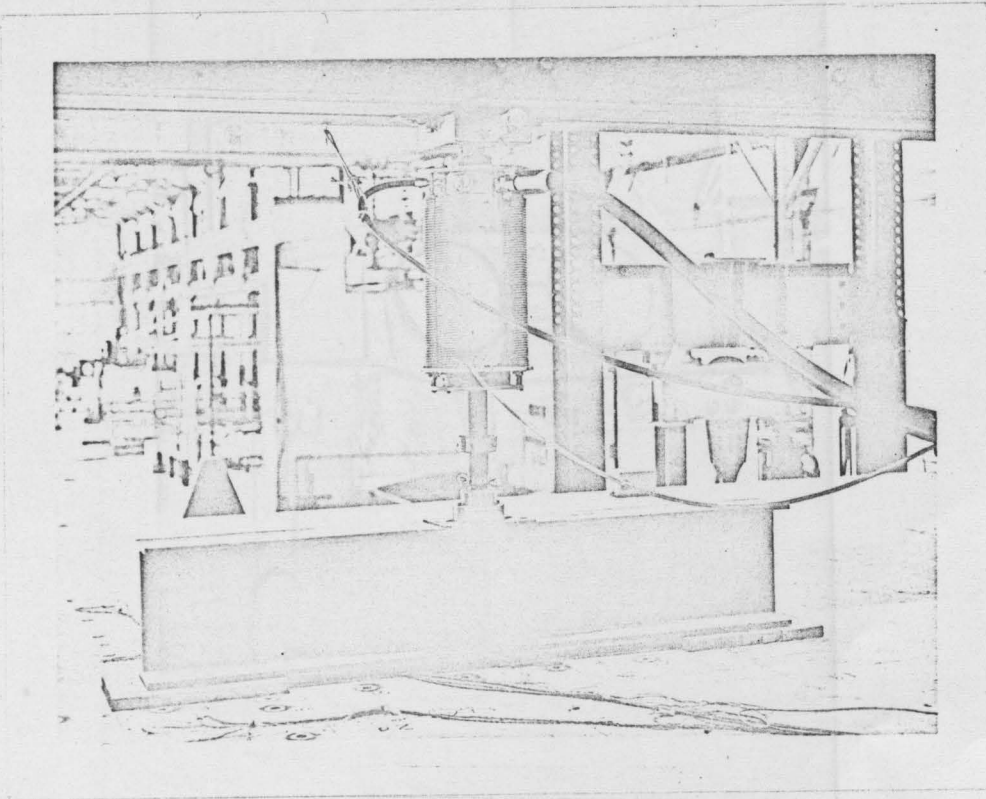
Hydraulic ram and loading pad arrangement for applying axle loads.
